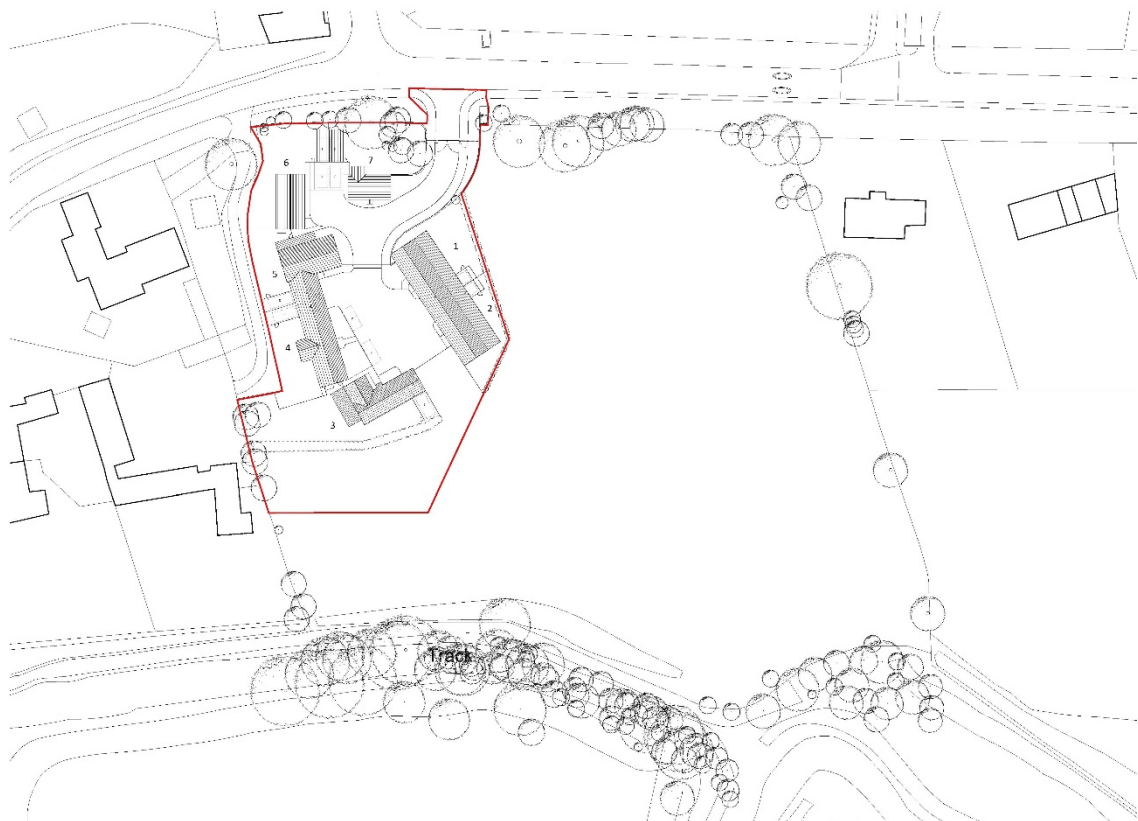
LOCATION OF THE APPLICATION SITE AND STUDY AREA IN RELATION TO CLIFTON ROAD (©BBA ARCHITECTS)
